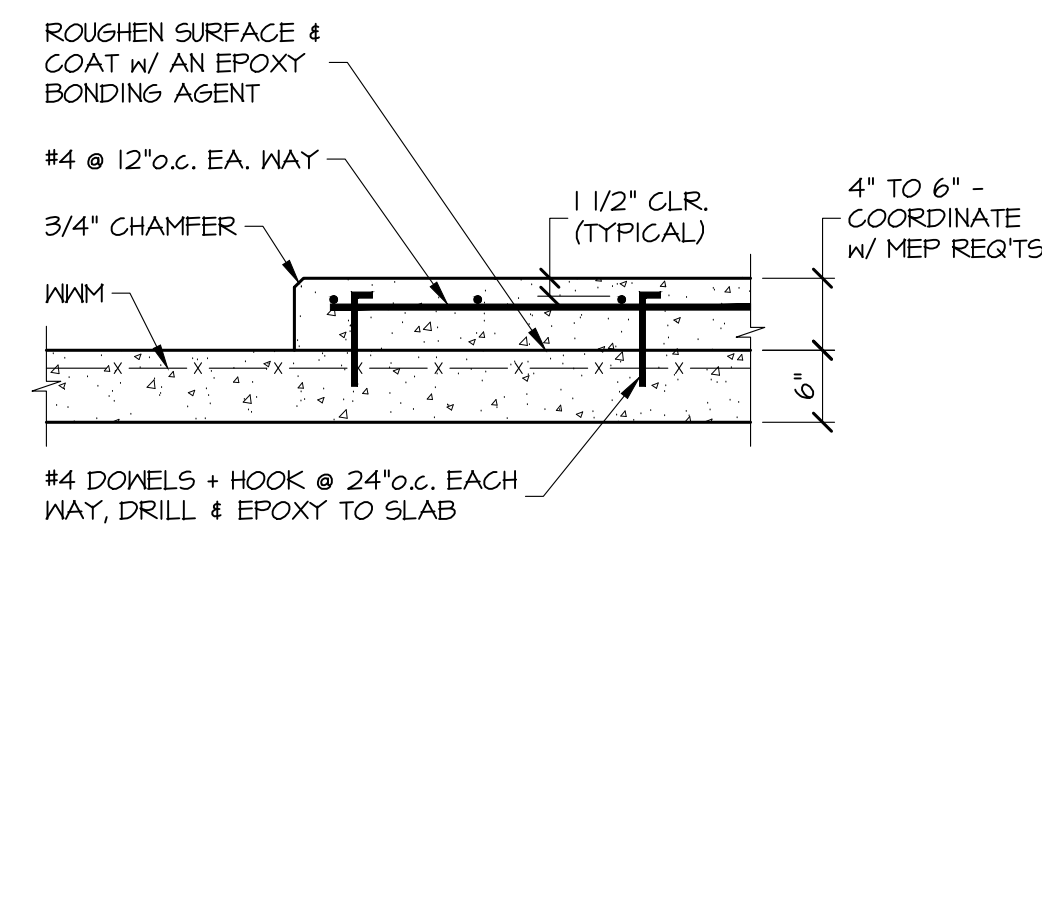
/4"=1'-0" TYPICAL FILL HEIGHT 8\"/>
